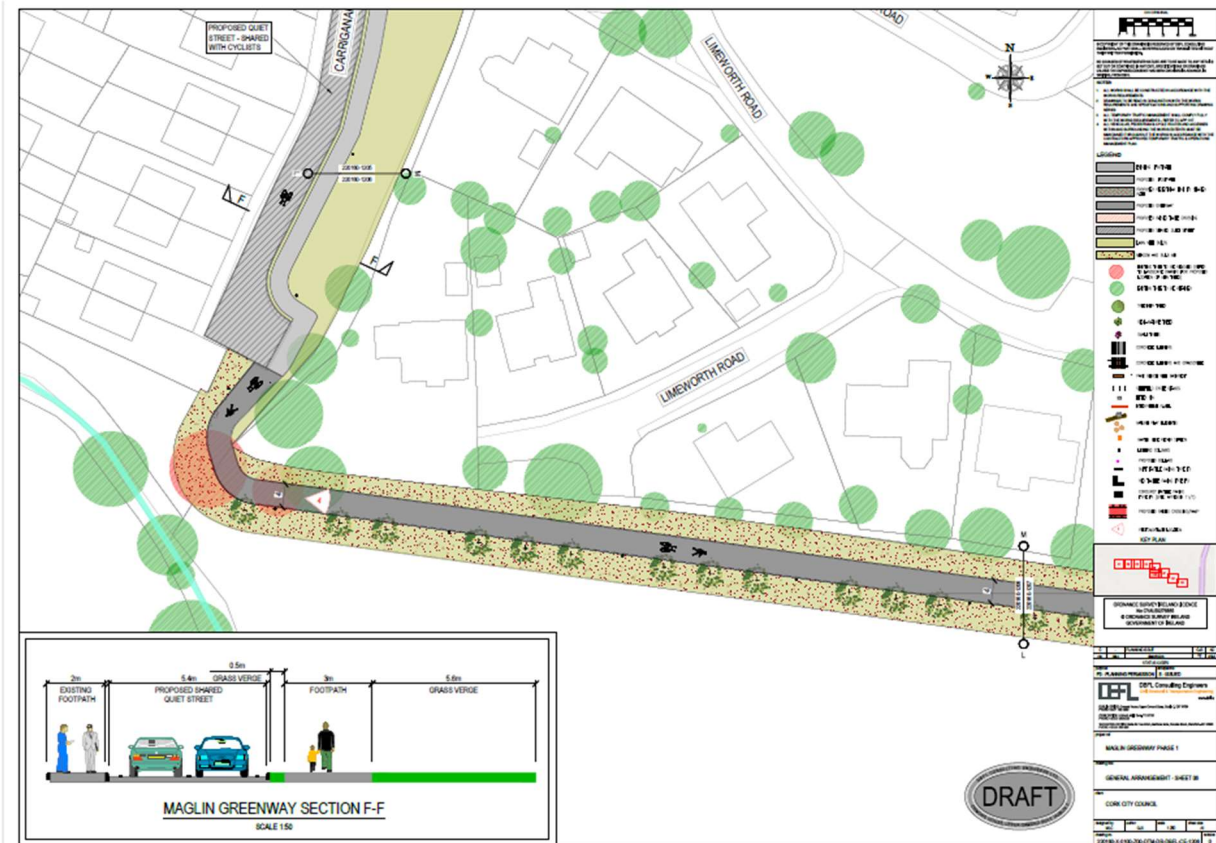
Proposed Route Detail 6 – Alignment through Carriganarra and around Limeworth estate
